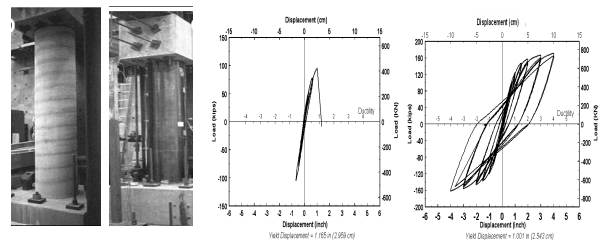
Full-Scale Cyclic Tests of As-Built and FRP-Repaired Columns
